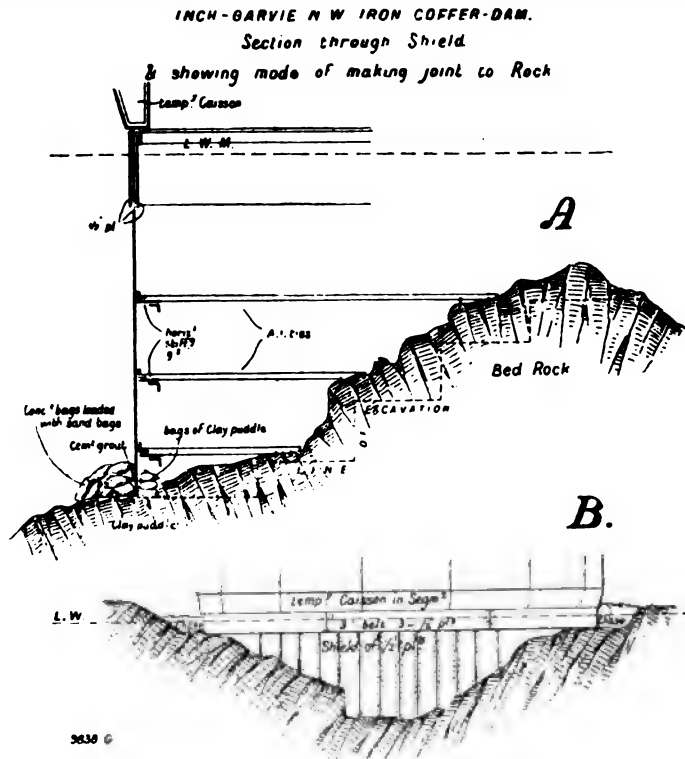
FORTH BRIDE. METAL COFFER-DAM.
